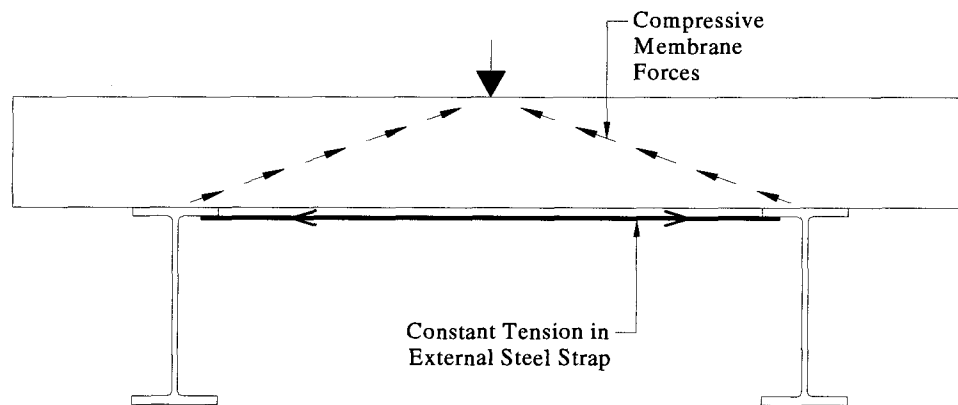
Arching Action in an Externally Reinforced Concrete Arch Panel
